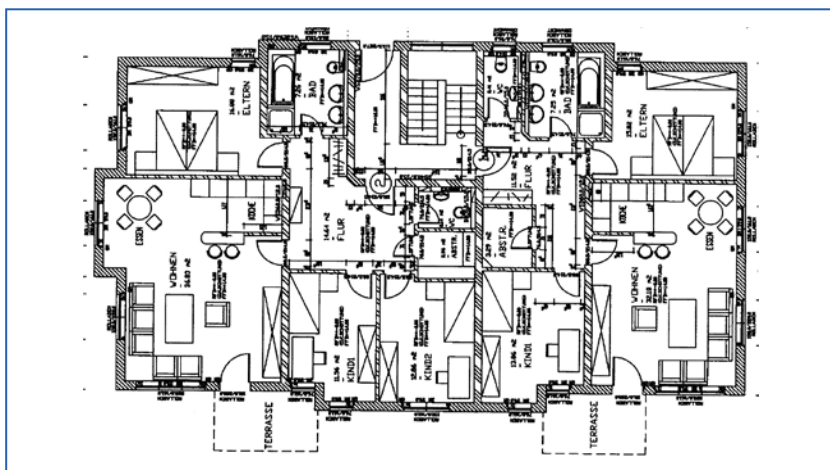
Ground plan (ground floor) of a typical 3 storey apartment house in Germany.
